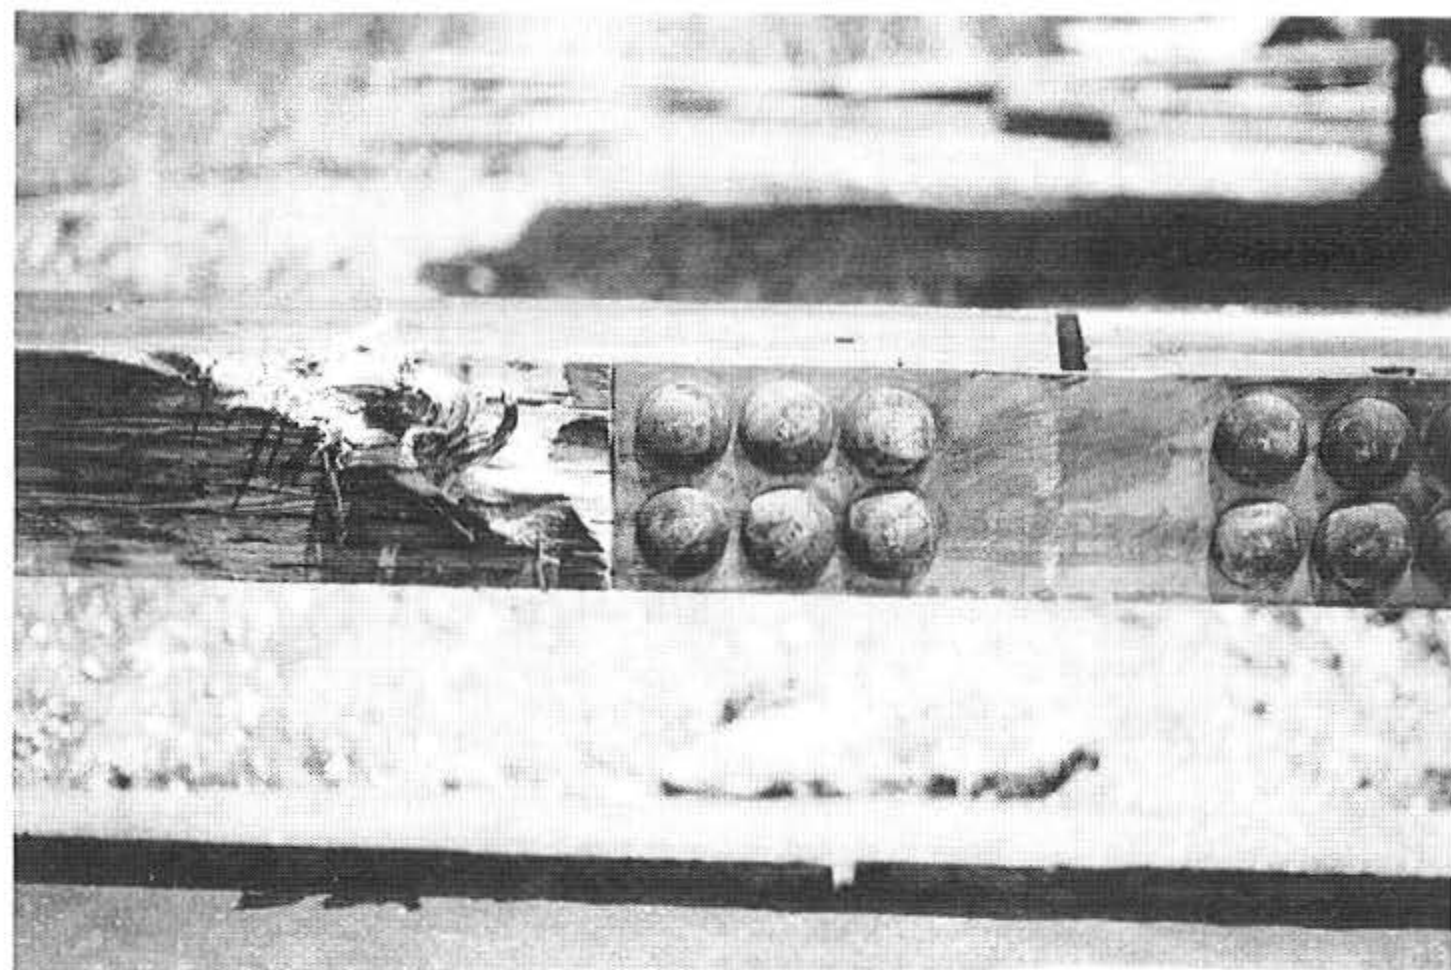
Damage to Glulam Rail and Splice Plate Connection, Test CTBR-1
